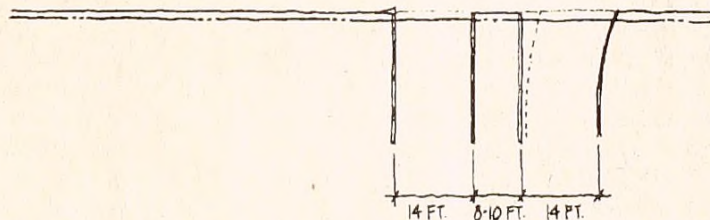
Typical Driveway Standards for Truck Access
